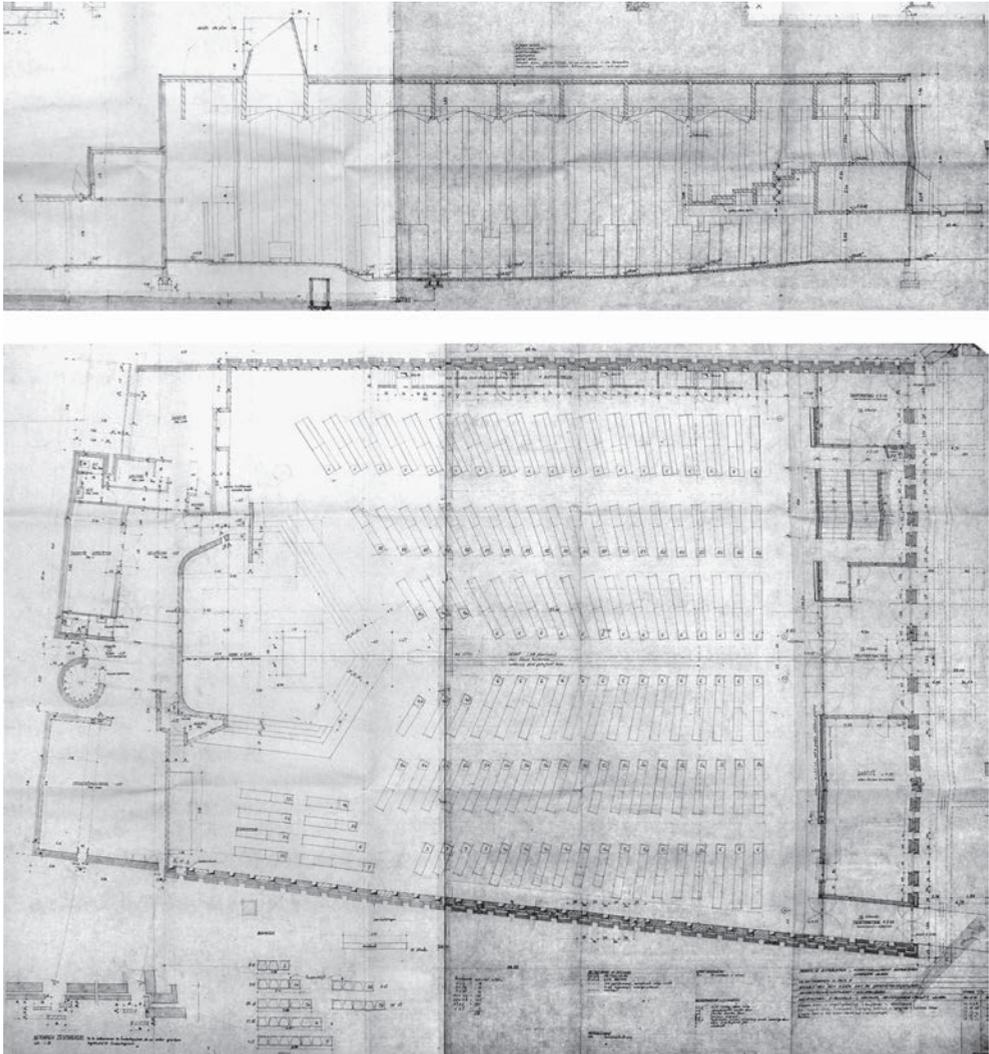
Longitudinal section and floor plan of the ground floor of the St Pius X's church in Wilrijk, architects Paul Meekels en Lode Wouters, 1966 (APA – *Archive of architect Lode Wouters, records of the St Pius X Wilrijk, LW 3.1.*).
